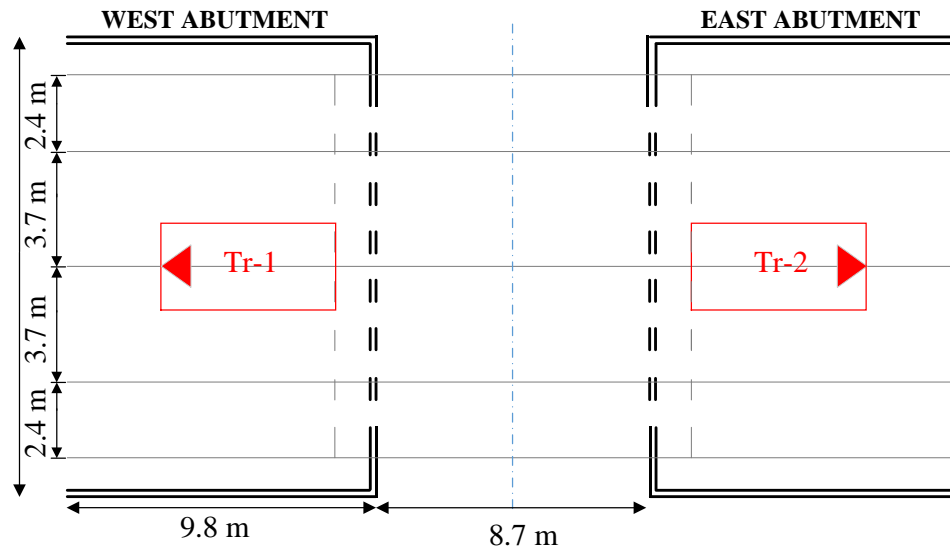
Live load test, truck position number 4 (P4) – trucks facing both east and west. Used for Live Load Test No. 10
